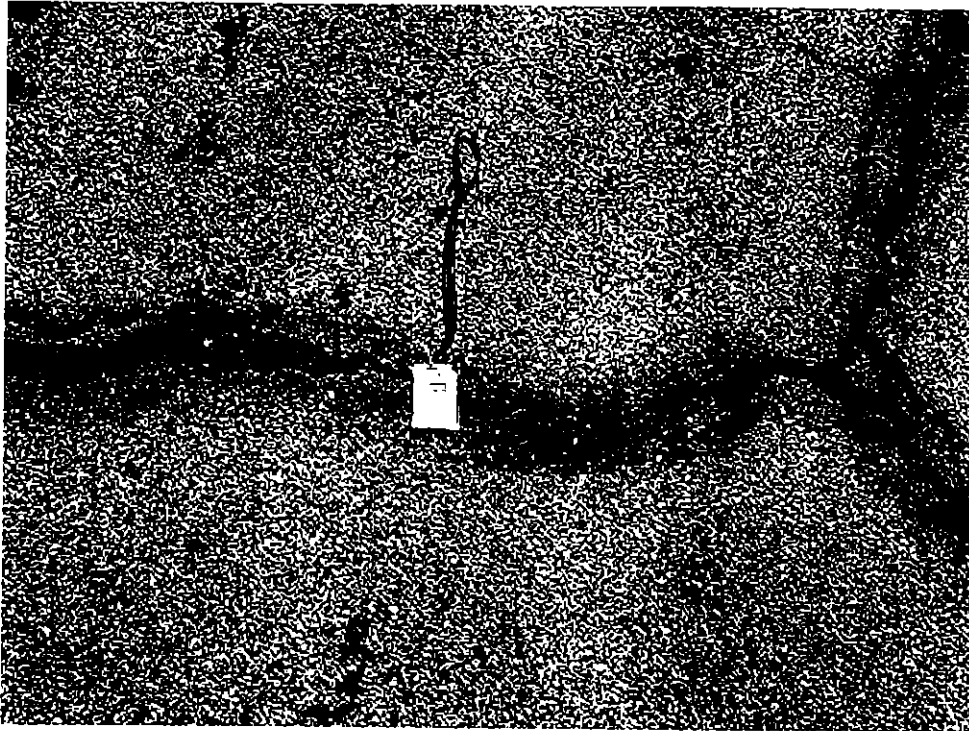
Pavement distress cracking in SR 66 near the primary access to the MW-20 bench.
